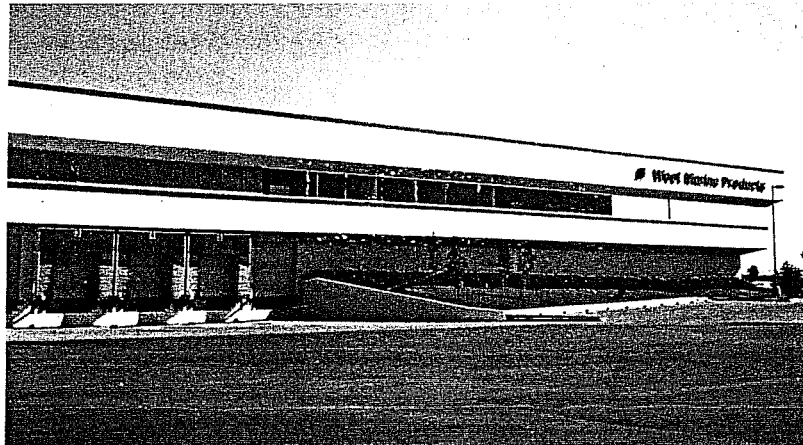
A Typical Steel High-Tech Industrial Structure
